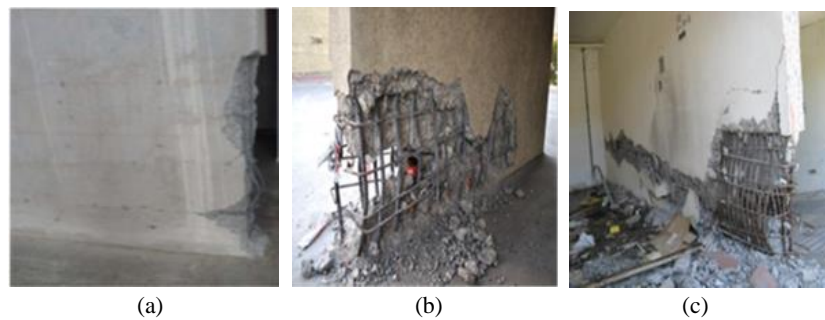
Examples of reinforced concrete shear walls damaged in earthquakes (Grossi et al., 2011); (Westenenk, B. et al., 2012).
